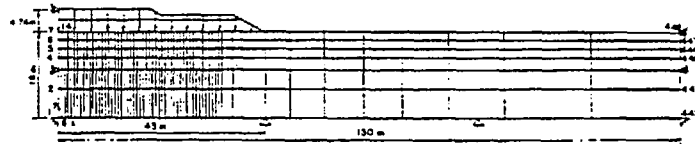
Finite Element Discretization of Embankment and Subsoils with Vertical Drains
